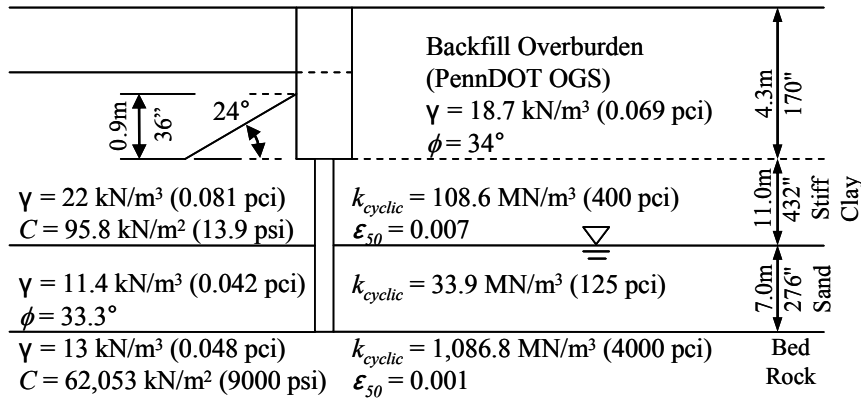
Bridge 211 Soil Properties under Abutment 2
